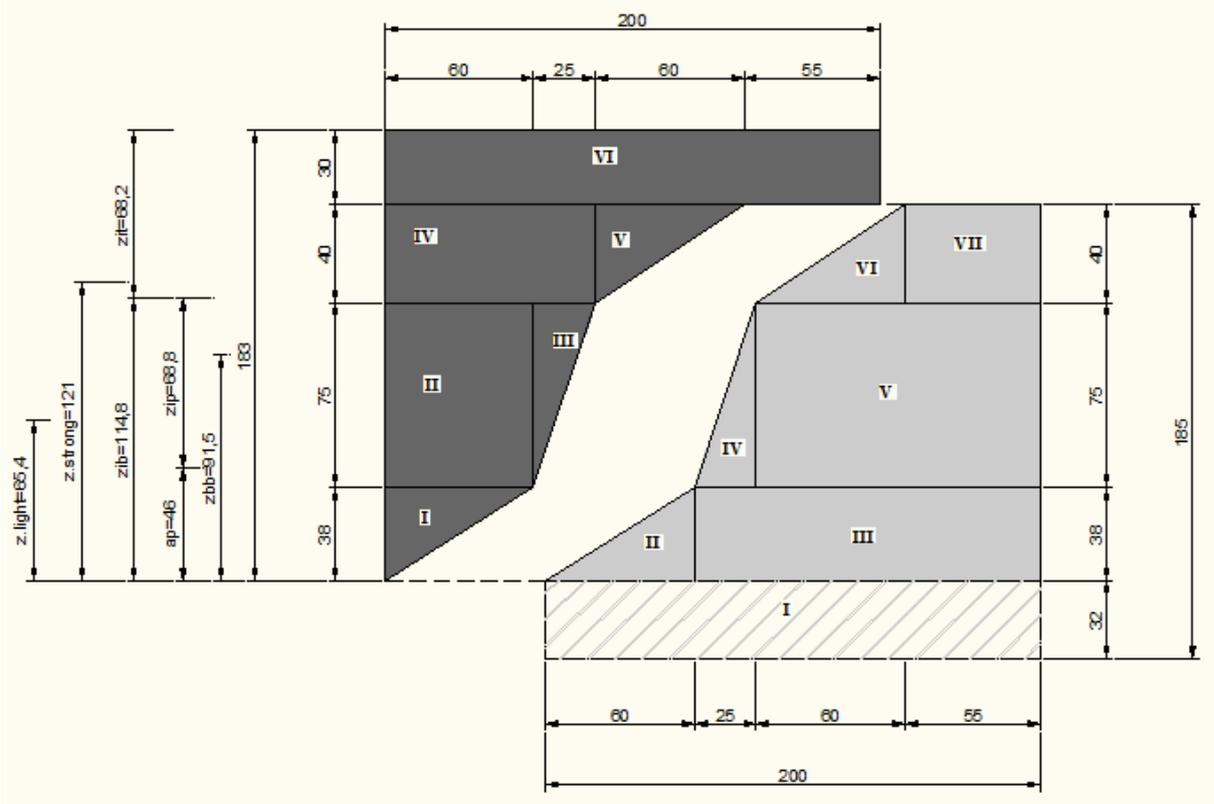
One sixth of the cross-section of the slab. The normal concrete is shown in dark grey and the light concrete in a light grey color.
